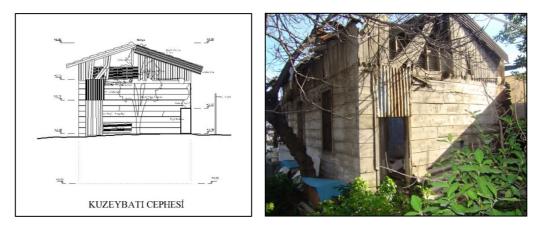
Drawing and Photo of Northwest Facade (Tanrıverdi, 2011)
